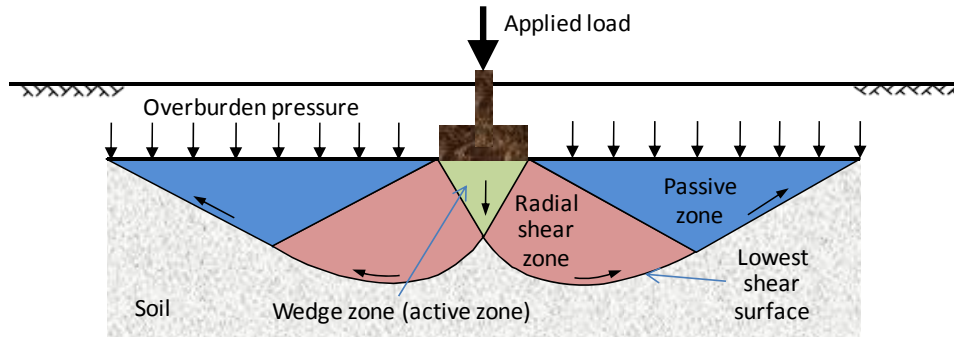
General failure mechanism in soil at ultimate load for a rigid strip footing (Terzaghi, 1943).
